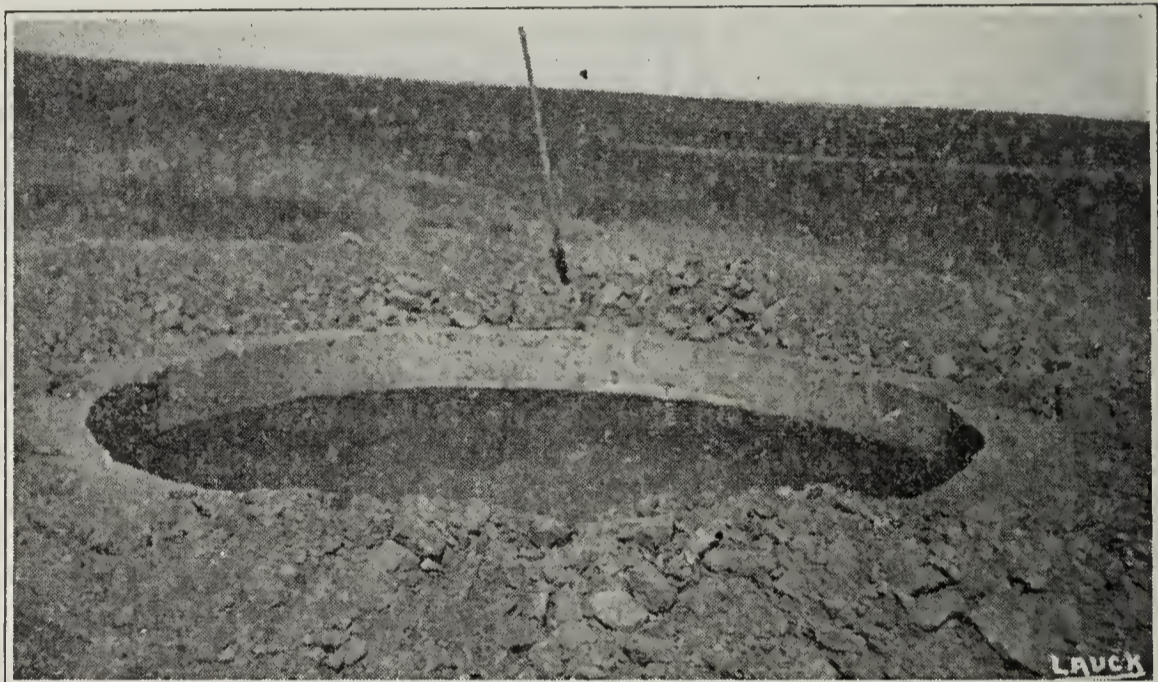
Fig. III. Pit silo in El Paso county, showing the concrete ring and a smooth wall ready for the plaster. (Photo by Lauck.)
